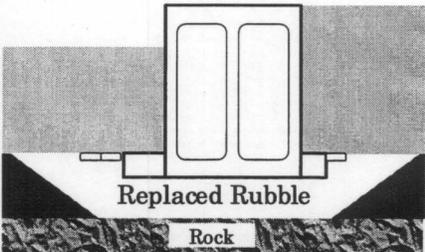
Prefabricated Steel Sheet Pile Cellular-bulkhead Quaywall
